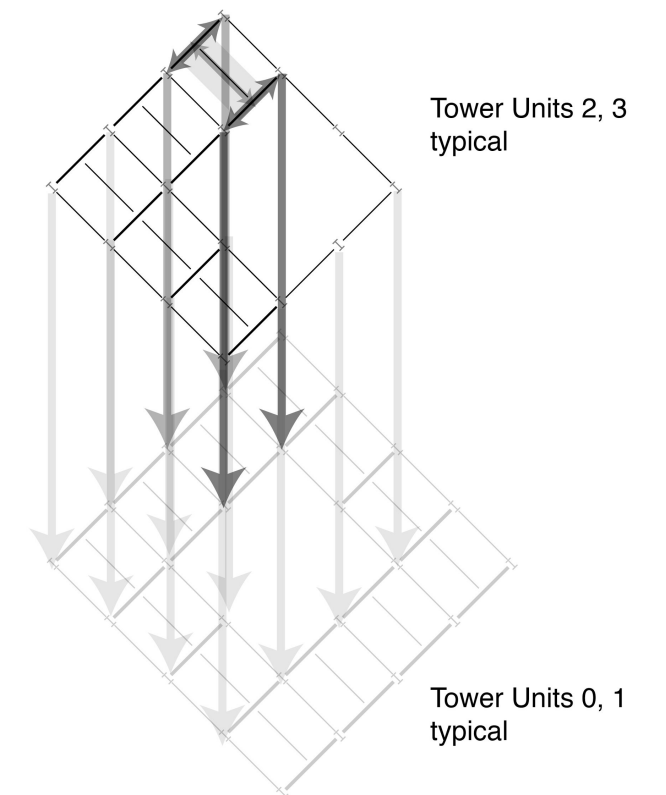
Typical gravity load path at the elevation level, illustrated here on how Tower Units 2 and 3 transition into Tower Units 0 and 1. No column transfers needed.
